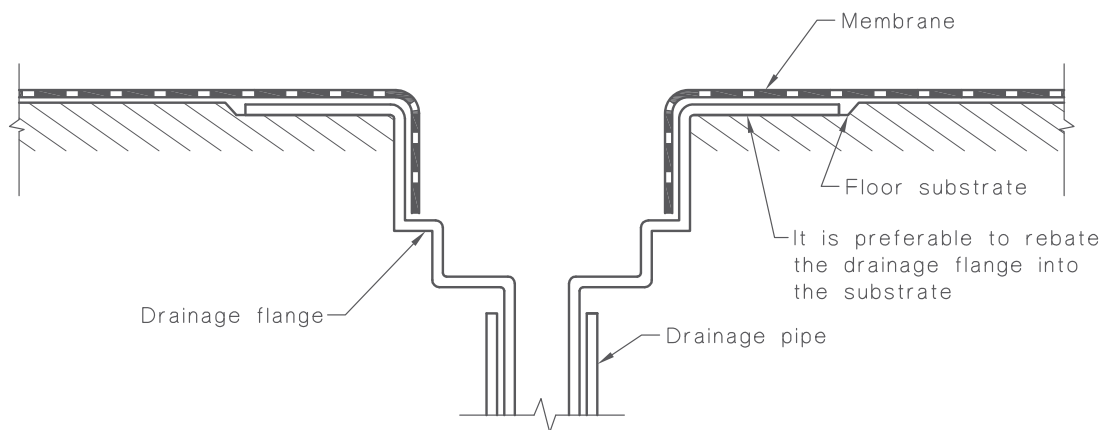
TYPICAL MEMBRANE TERMINATION AT DRAINAGE FLANGE
